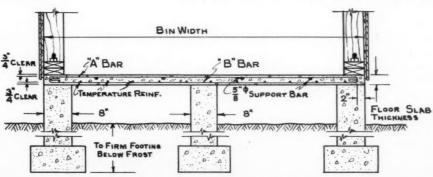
Typical cross section through a suspended grain bin floor of reinforced concrete
